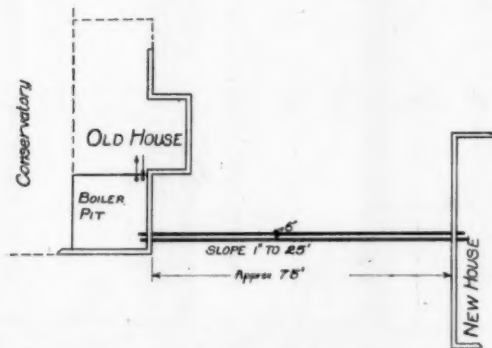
CONDUIT CONNECTIONS TO NEW CONSERVATORY.
